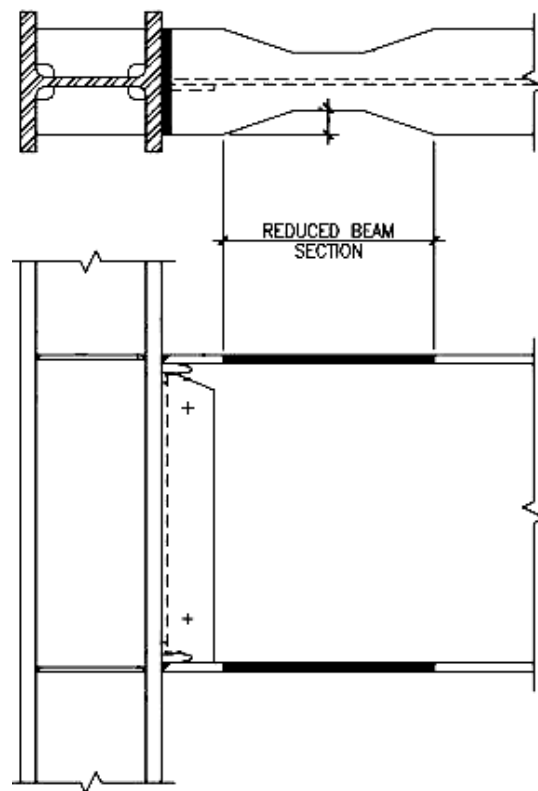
Reduced Beam Section (RBS) connection [11]
